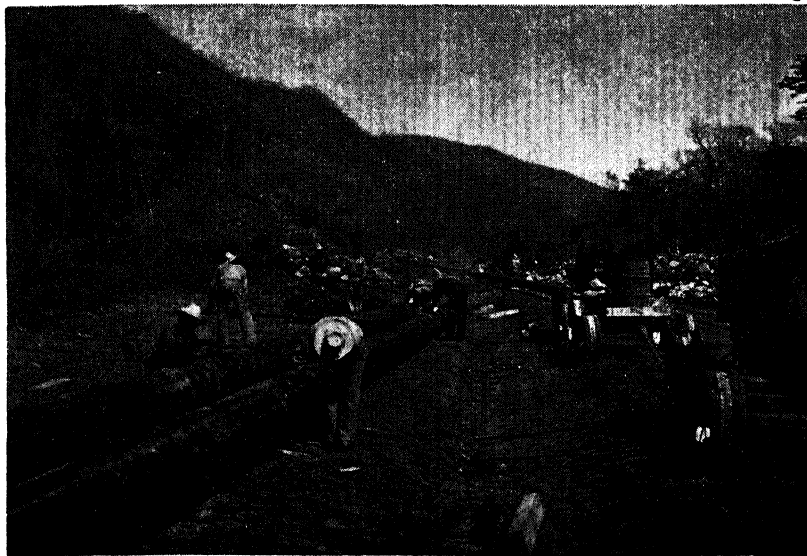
A firing line gang on a 16-in. oil line in Venezuela. Gang consisted of one tacker and five welders. Joints are V-groove butt joints without liner. First pass made with $3/16$ -in., second pass with $1/4$ -in., third pass with $5/16$ -in. Type A shielded arc electrode.
